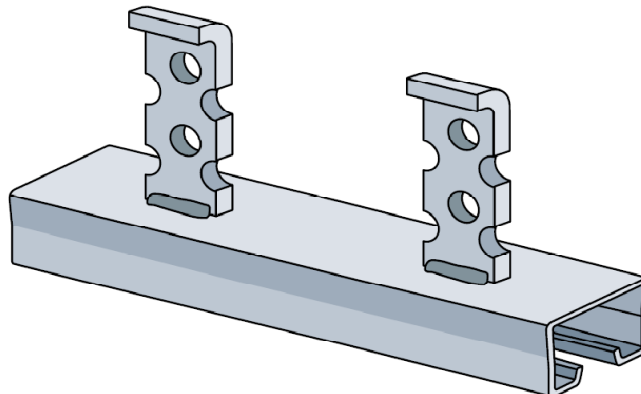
Hook type anchorage similar to that used in lifting precast elements.
